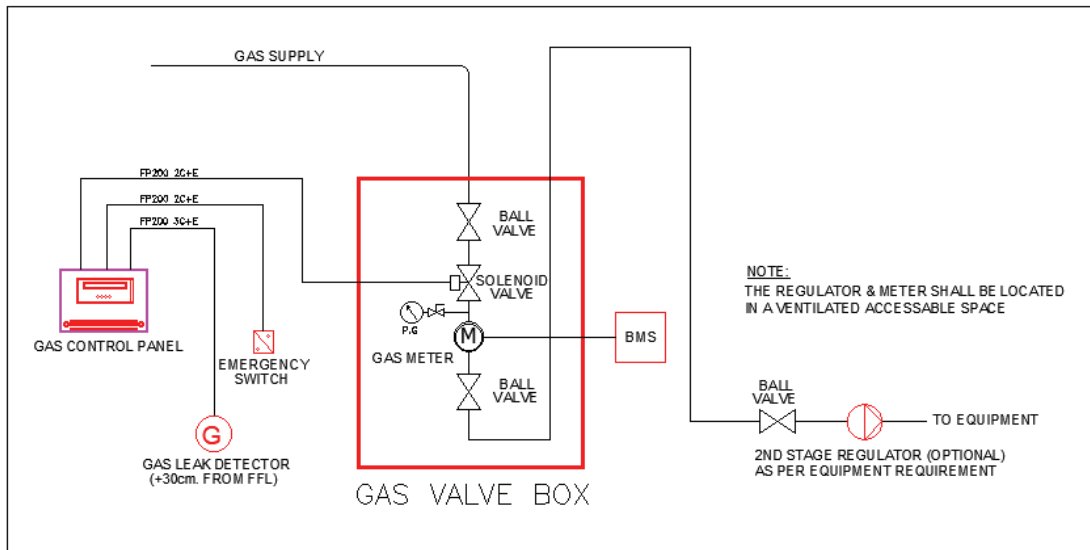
b. Typical Connection for Industrial Equipment.
